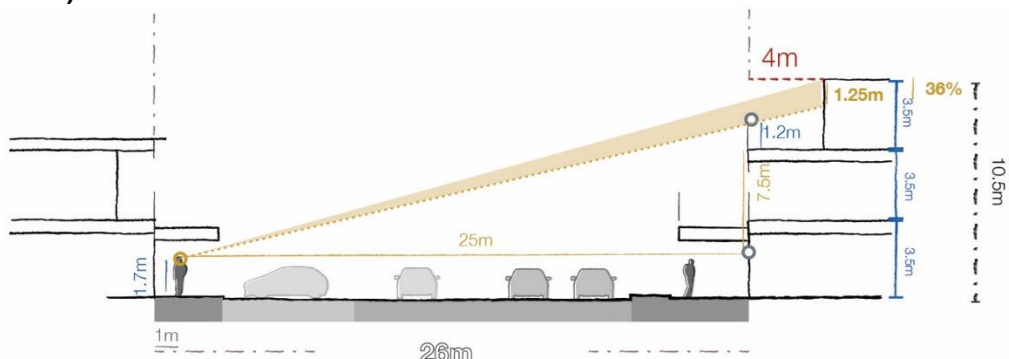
Third storey building setback, indicative diagram (Main Road 20m road reserve)
